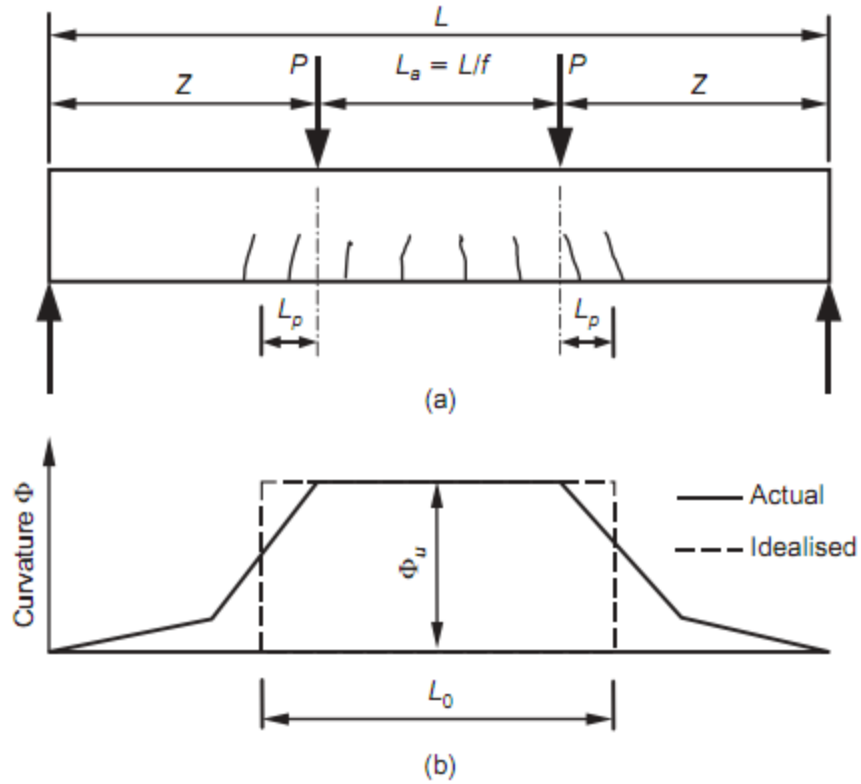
A simply supported prestressed concrete beam with unbonded tendons under two symmetrically disposed point loads: (a) arrangement of loading; (b) actual and idealised curvature distribution along the beam (Au and Du, 2004)
